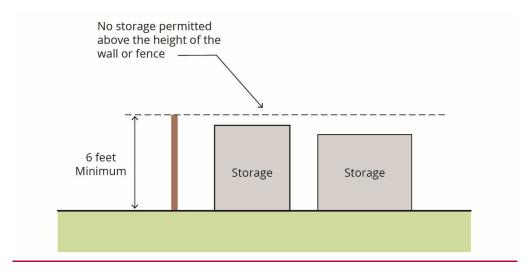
OUTDOOR STORAGE AREA SCREENING
